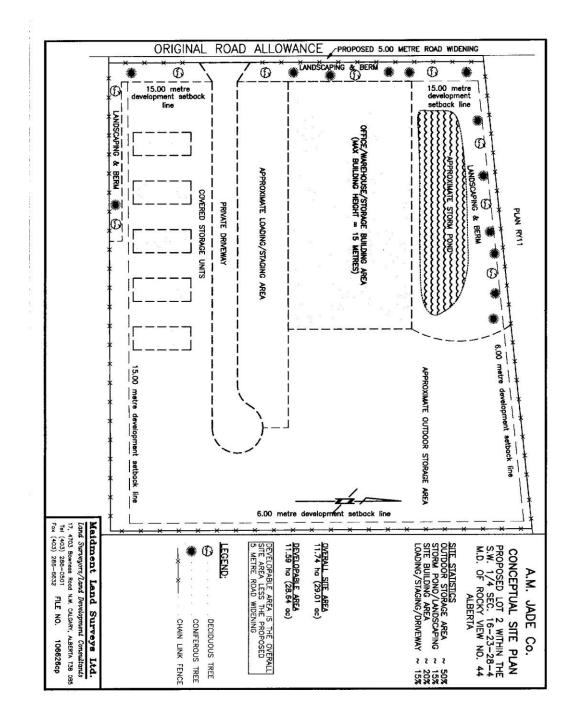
Concept Site Plan – Lot 1 – AM Jade Co. Inc. Shepard Property.
